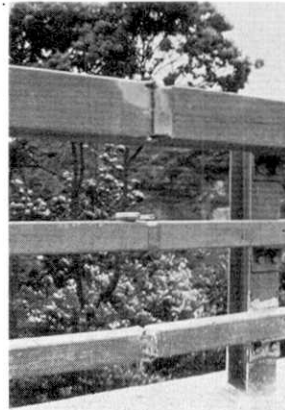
Damage to a handrail on the Tengu truss bridge.
